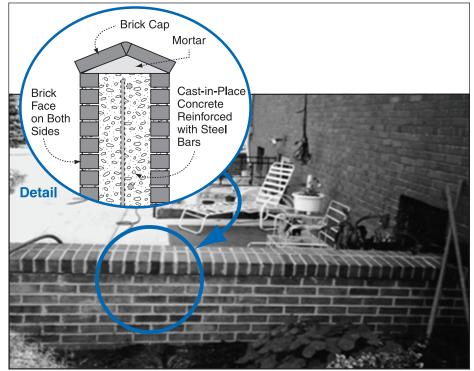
Typical brickfaced concrete floodwall. Detail shows cross-section through wall.
